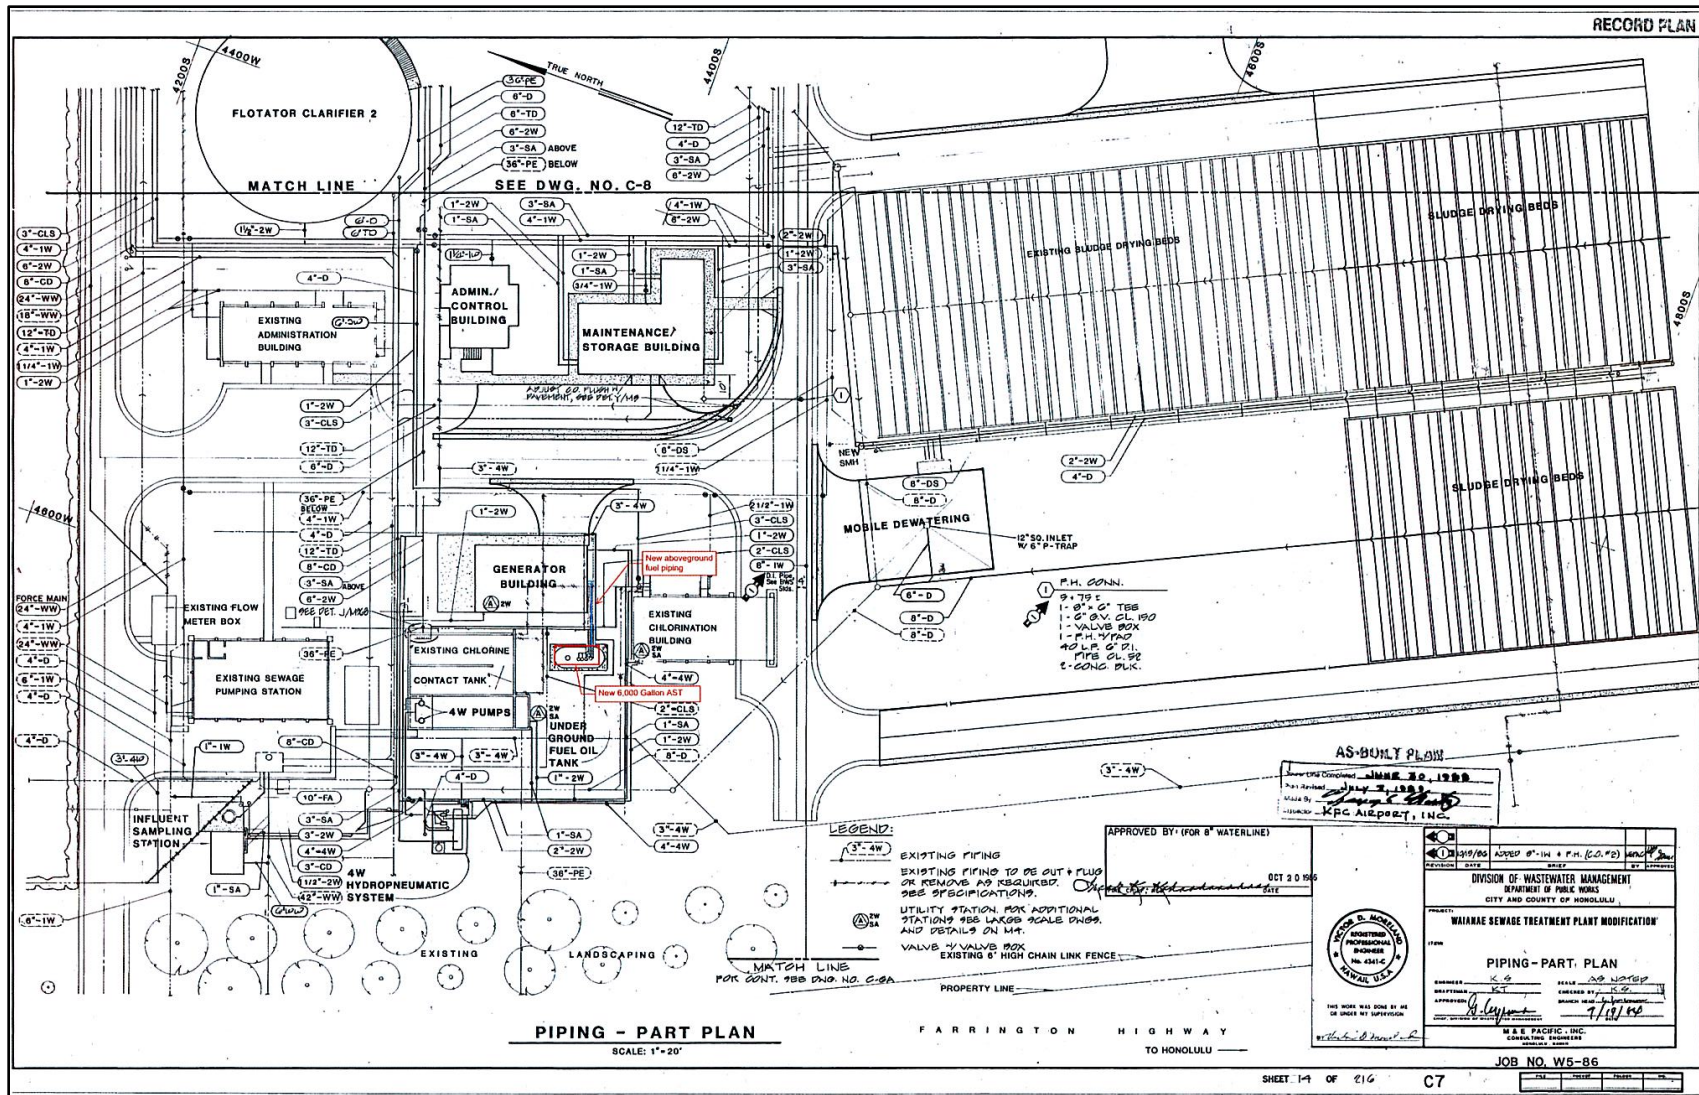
Record Piping Plan showing the location of the proposed new 6,000-gallon AST and new above ground fuel piping in the west central portion of the Waiānae WWTP (Okahara and Associates, Inc.; courtesy of client)
